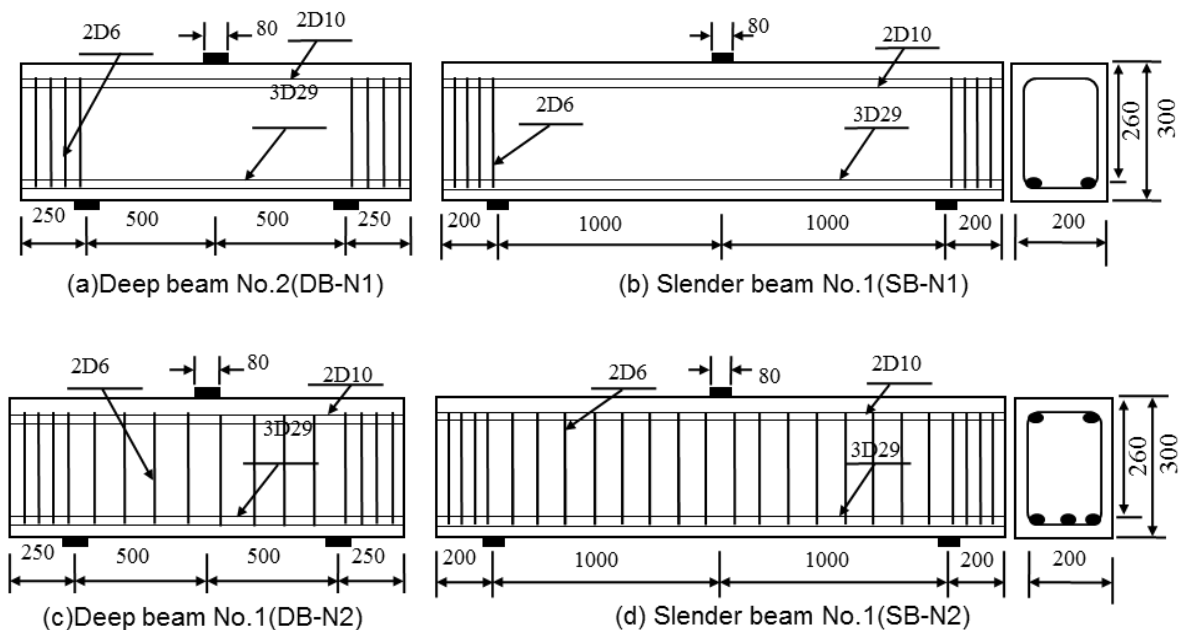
Shear compression failed specimen without and with stirrup (all dimension in mm)
